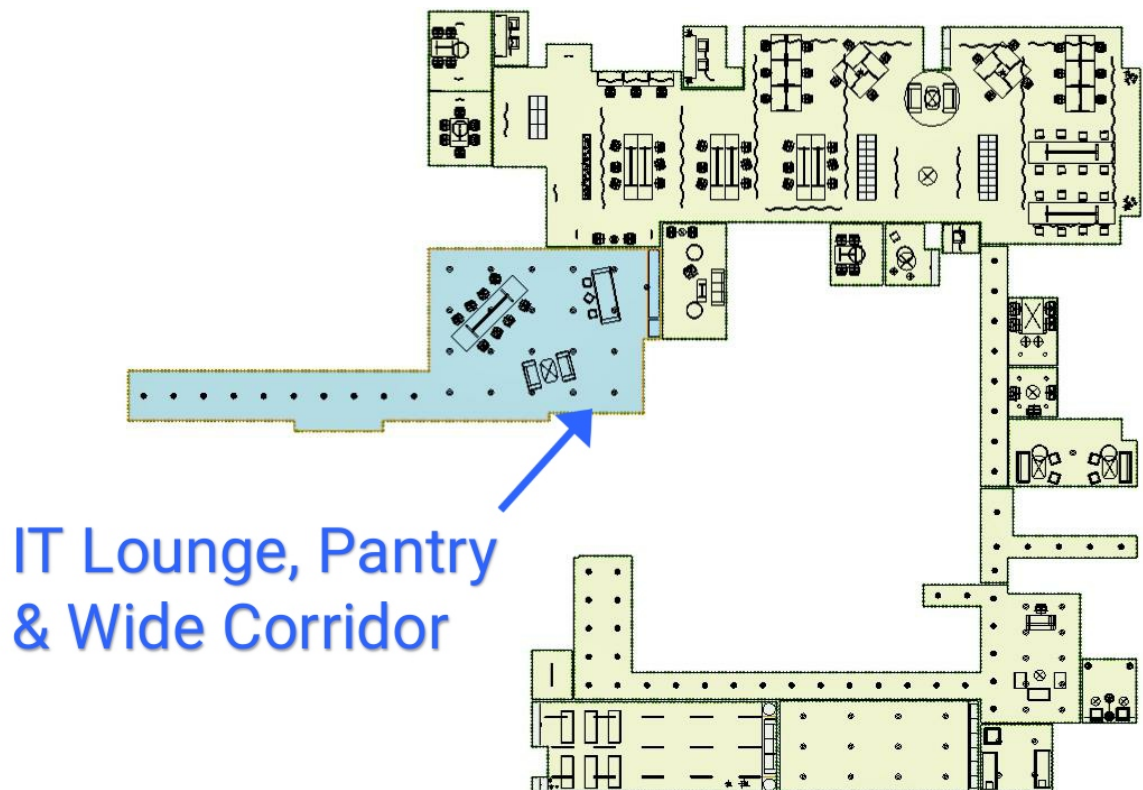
Layout of 'IT Lounge, Pantry & Wide Corridor'
